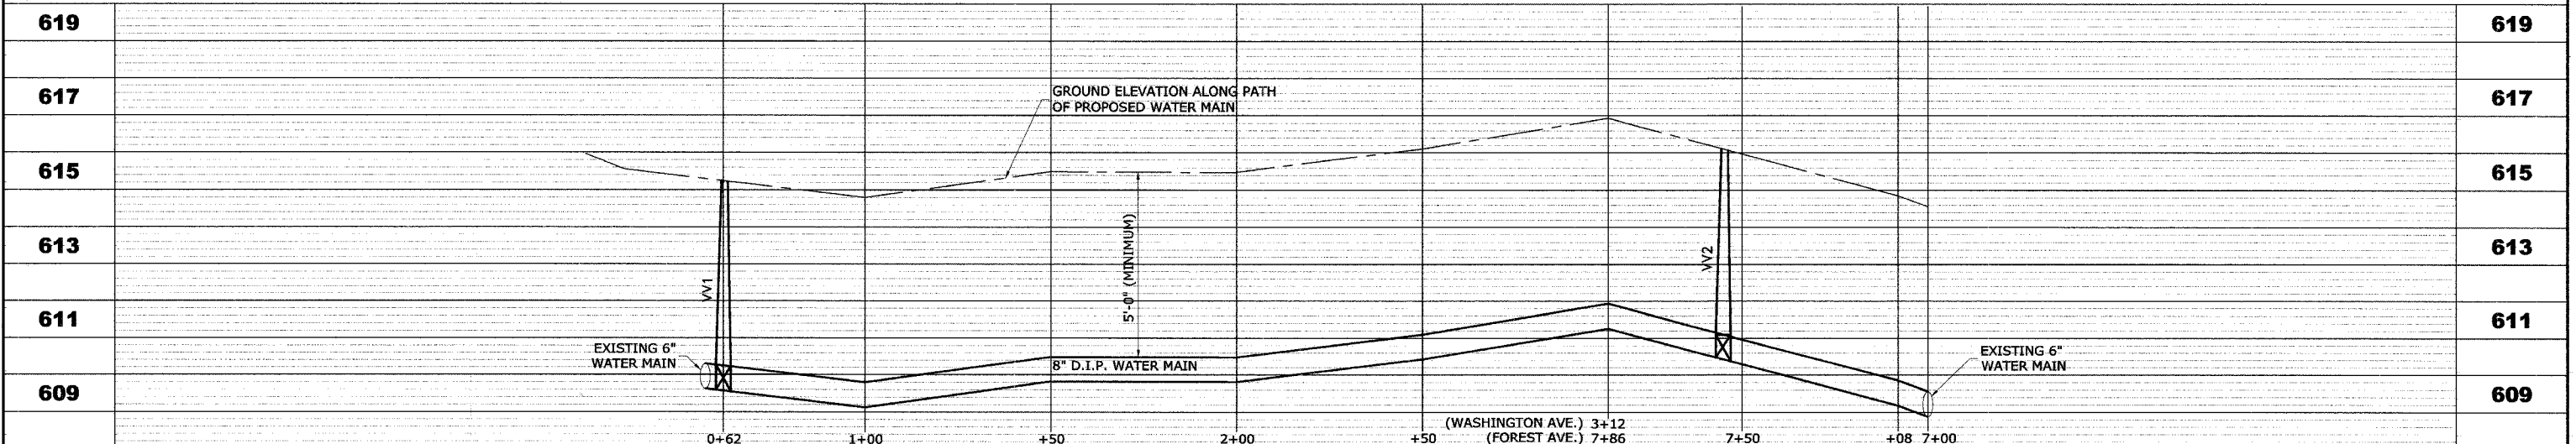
DETAIL OF CONNECTION TO EXISTING WATER MAIN ON PRAIRIE AVENUE
